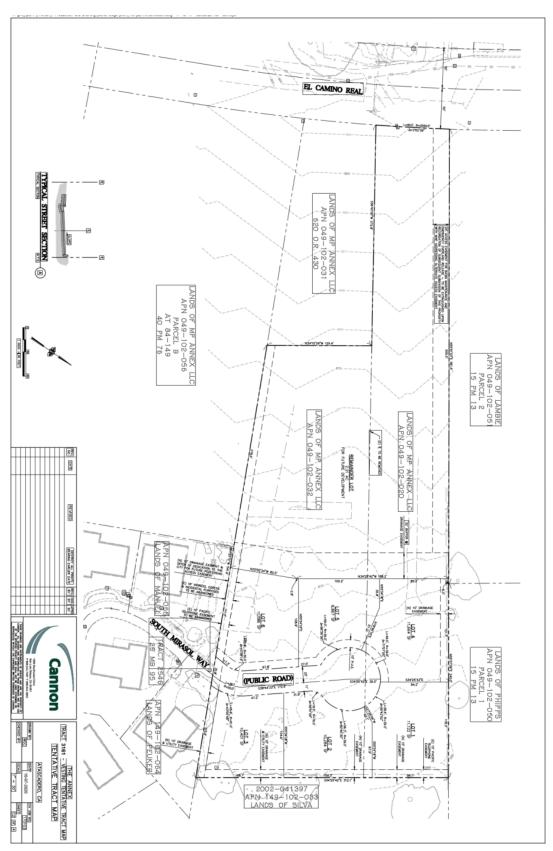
EXHIBIT C: MASTER PLAN OF DEVELOPMENT / SITE PLAN
